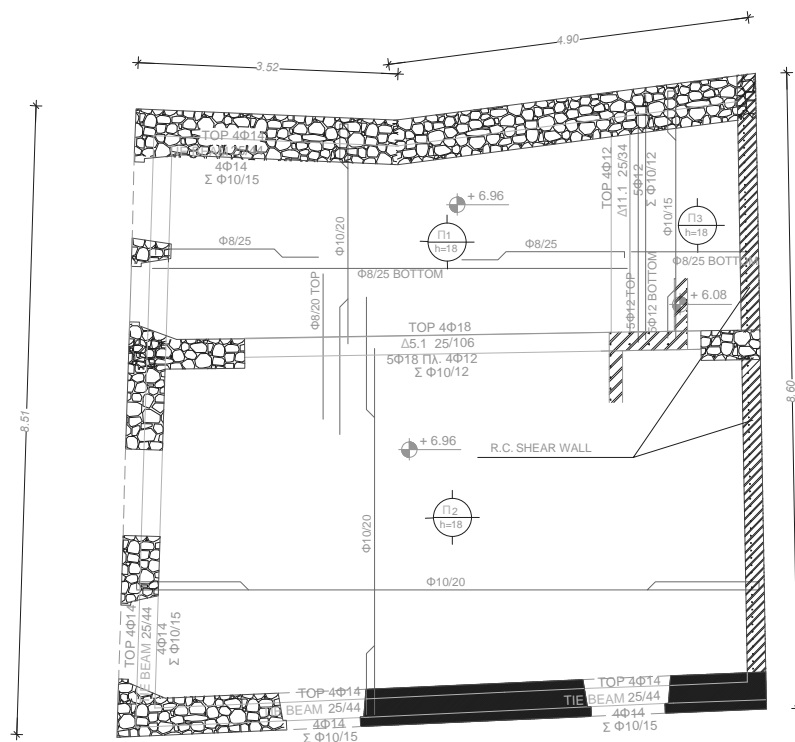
Steel reinforcement of members at the first floor (reflected ceiling) level.
